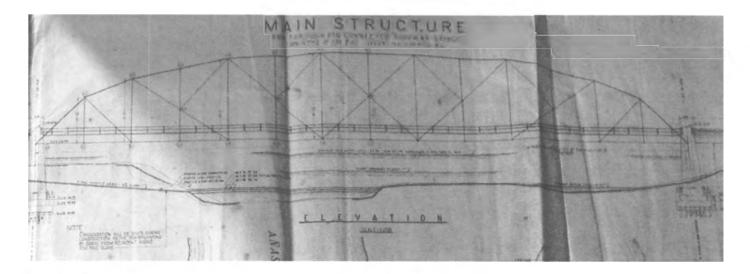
Elevation plans for the Añasco River Bridge metallic structure, 1940.
